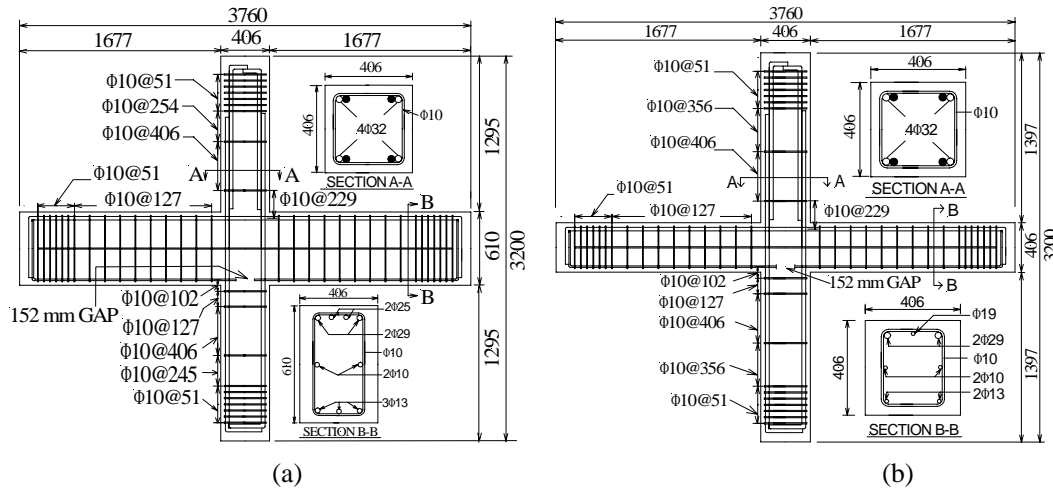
Specimen dimensions and reinforcement details: (a) Type I, (b) Type II.
